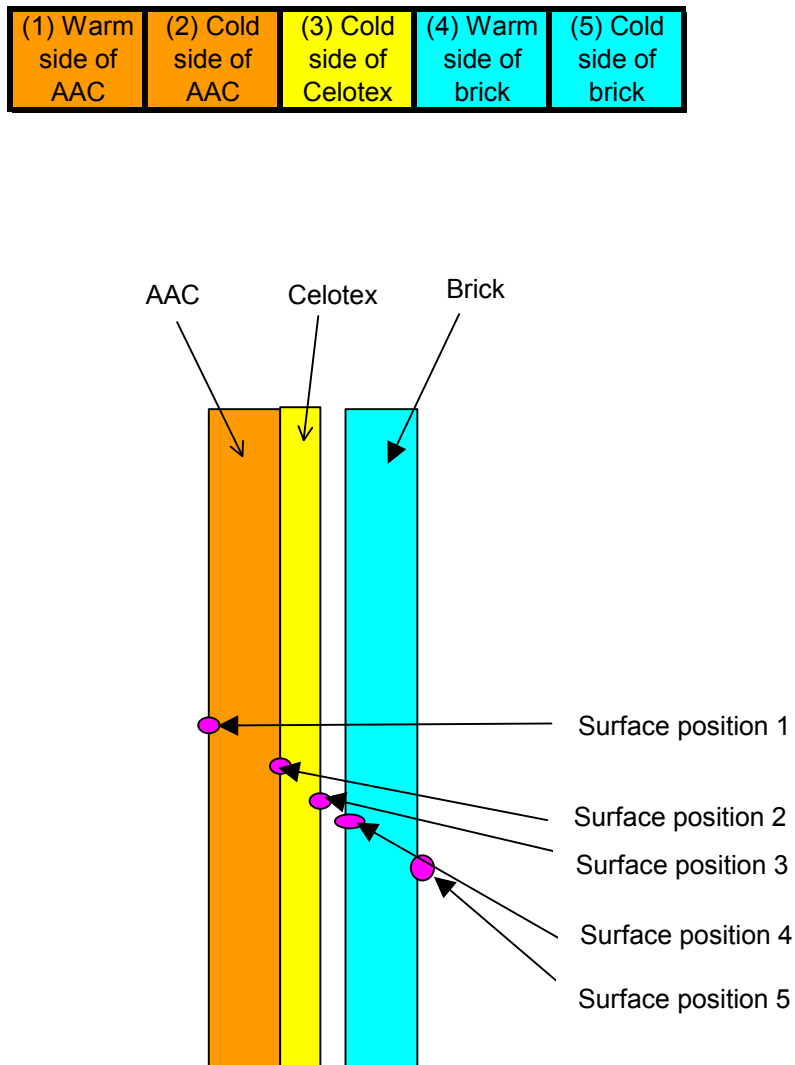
Wall 3 - No Plasterboard - Thermocouple positions
